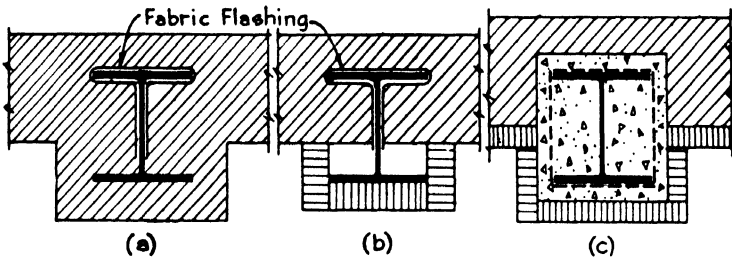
Encasing Exterior Wall Columns. (a) brick; (b) brick and tile furring; (c) concrete, brick and tile.
